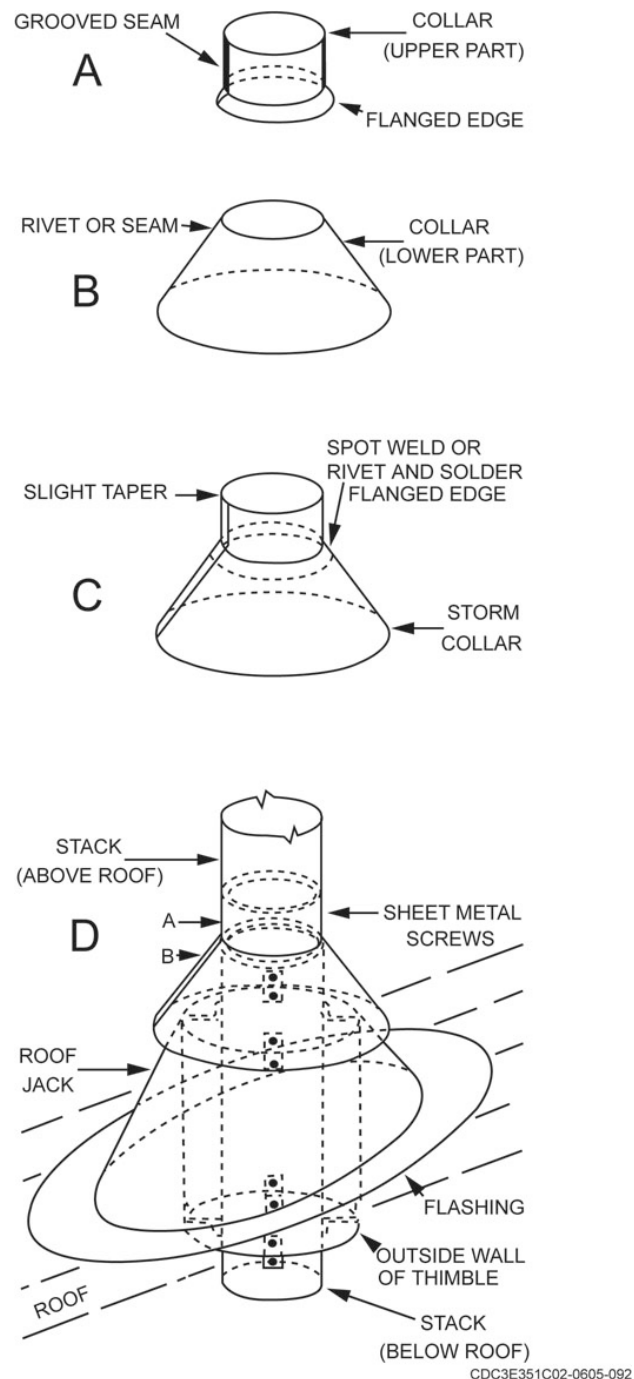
Storm collar, roof jack, and double-wall thimble.
